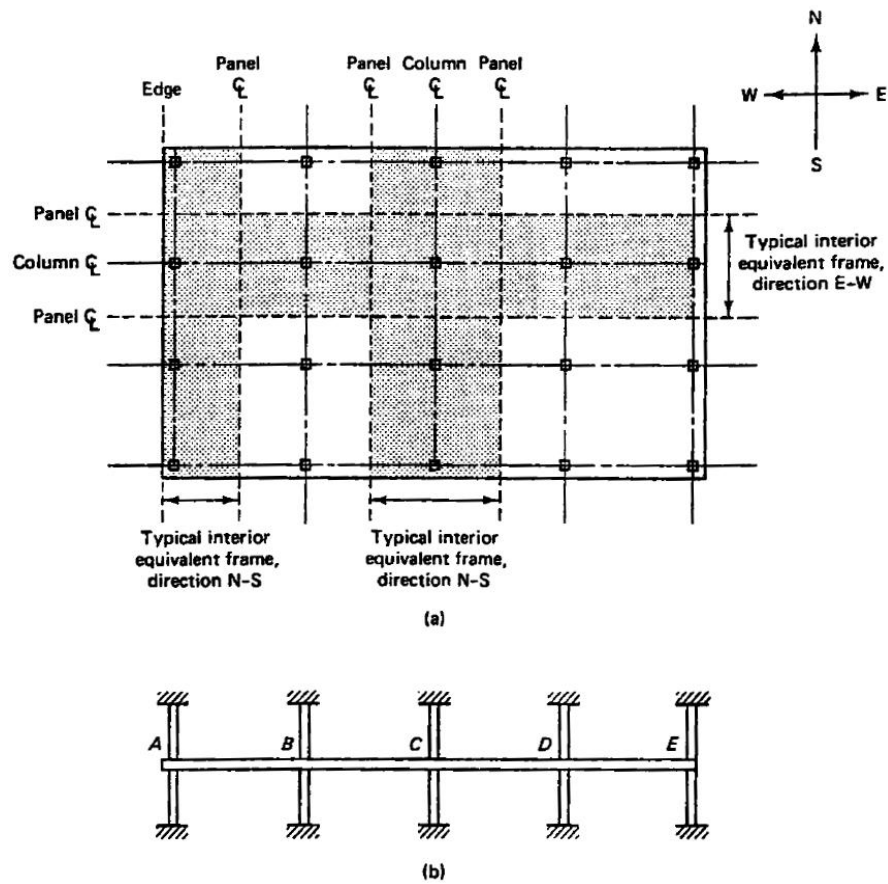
Idealized structure divided into equivalent frames. (a) Plan. (b) Section in E-W direction.
